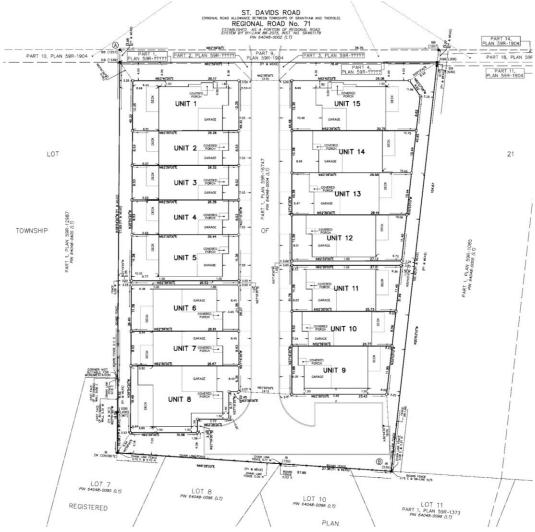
Excerpt from plan of vacant land condominium (source: Applicant)
